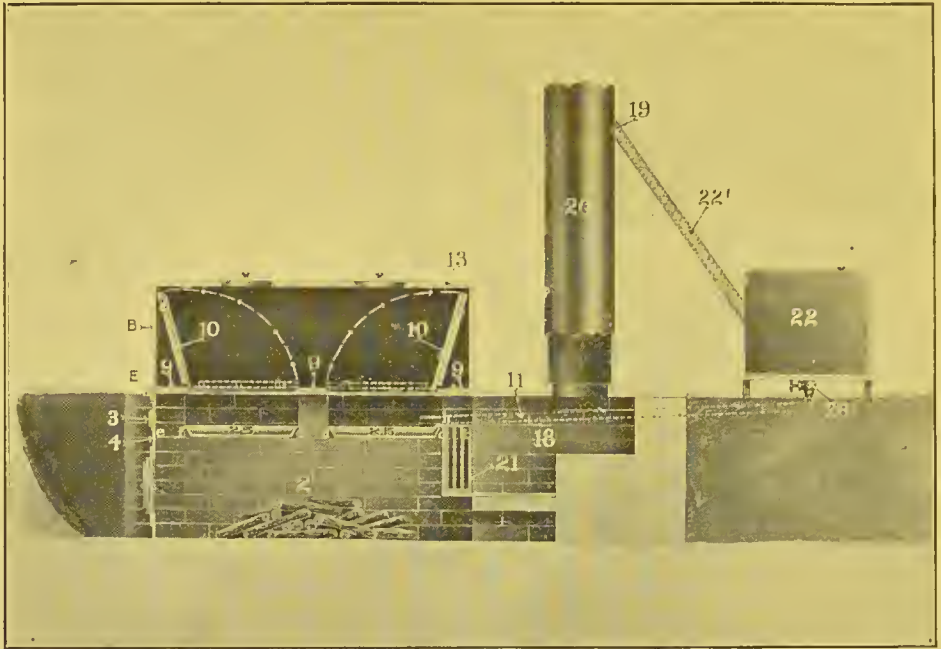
MCCALL INCINERATOR : LONGITUDINAL SECTIONAL ELEVATION.
